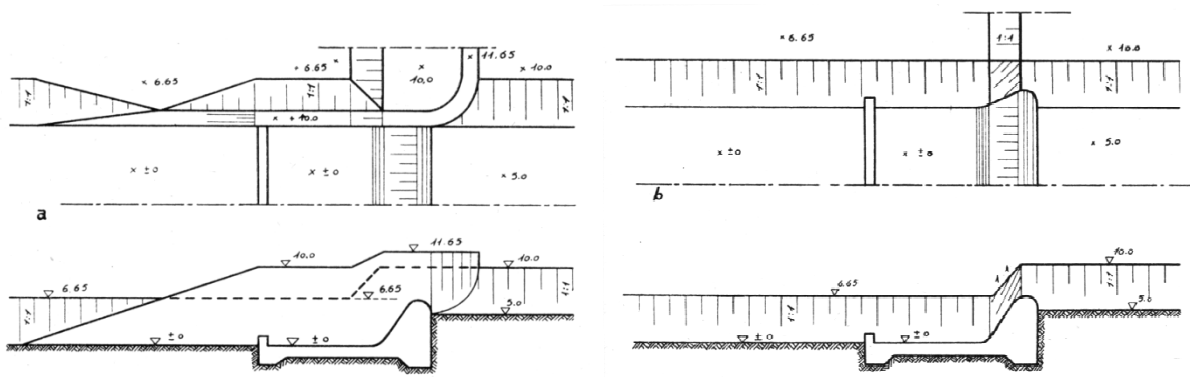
weir with wing walls (left), weir with connecting banks (right)
